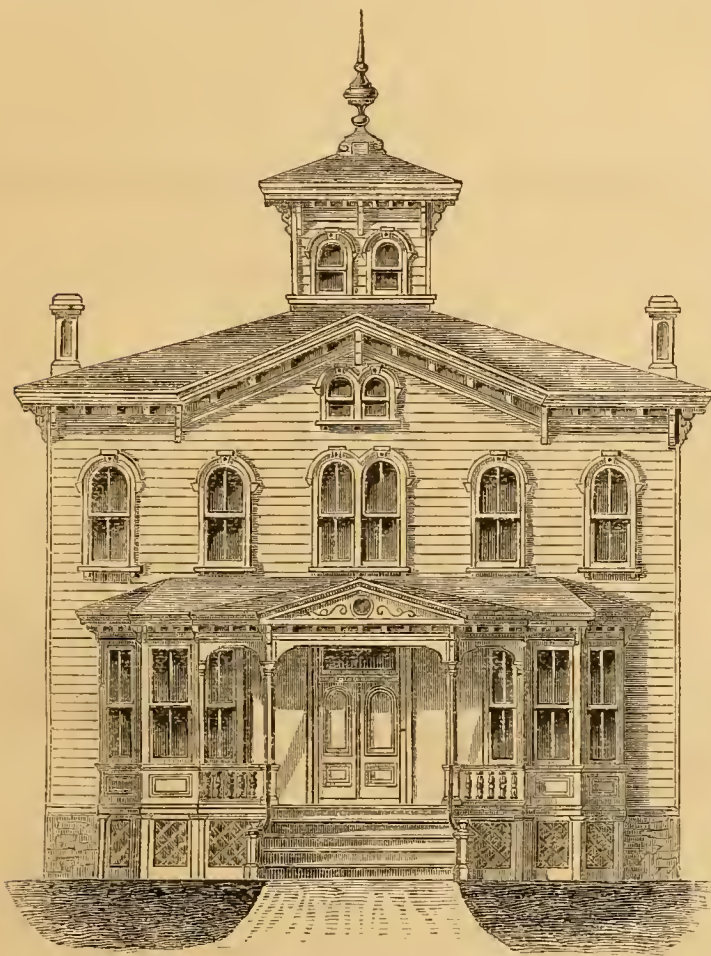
ELEVATION OF FRONT OF HOUSE.
